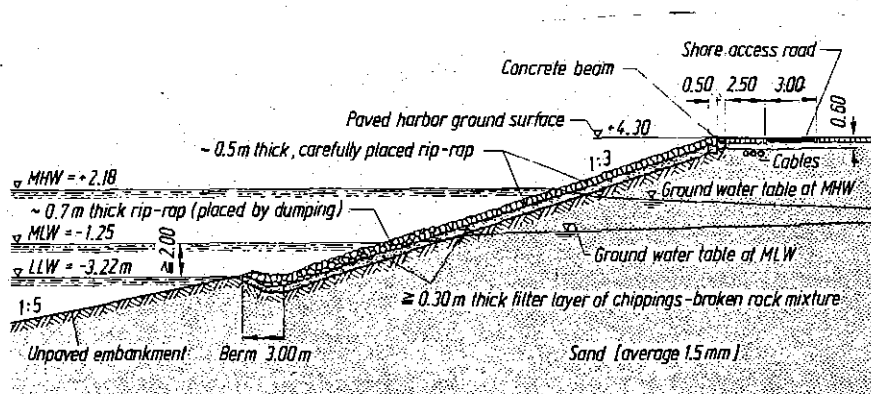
Standard construction of a harbor embankment in Bremen, with permeable revetment
